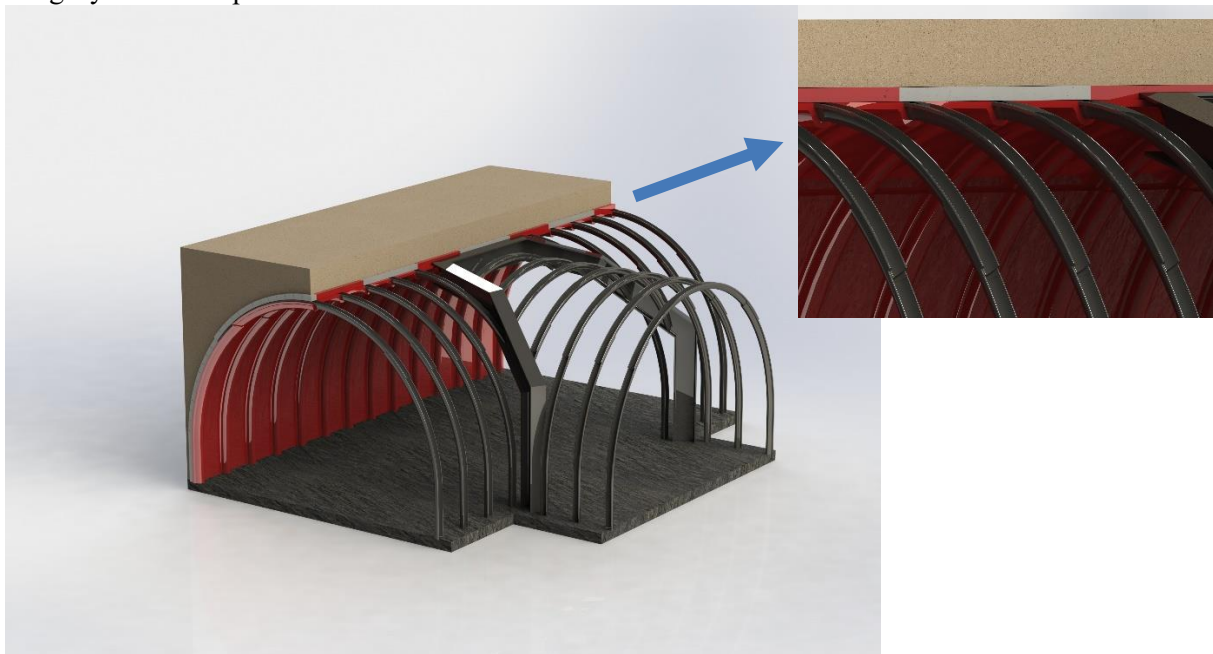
Typical yielding steel arch support with precast concrete liner used in Polish coal mines.
